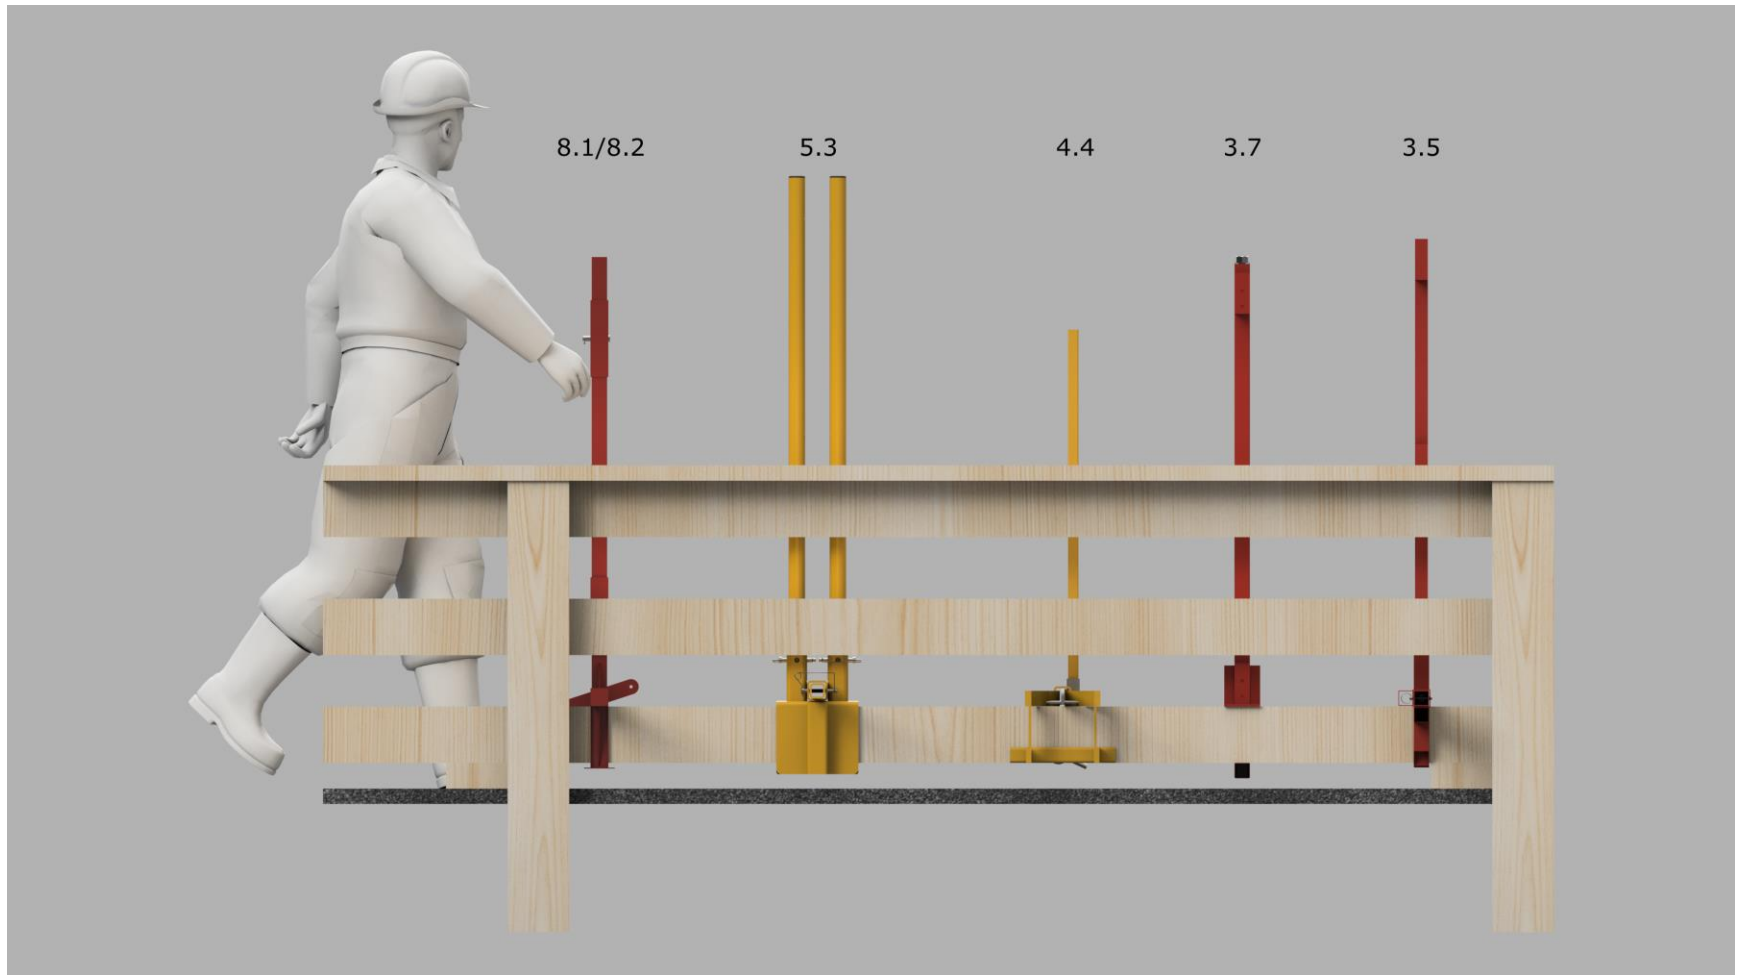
Guardrail Type 22, wheel guard fit; view from the west
